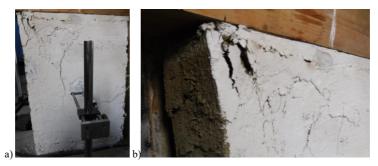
The wheat straws disperse reinforcement (WS R) poured earth wall elements – failure under compressive loading: a) WS R wall element; b) WS R wall element - upper corner failure detail [44]
